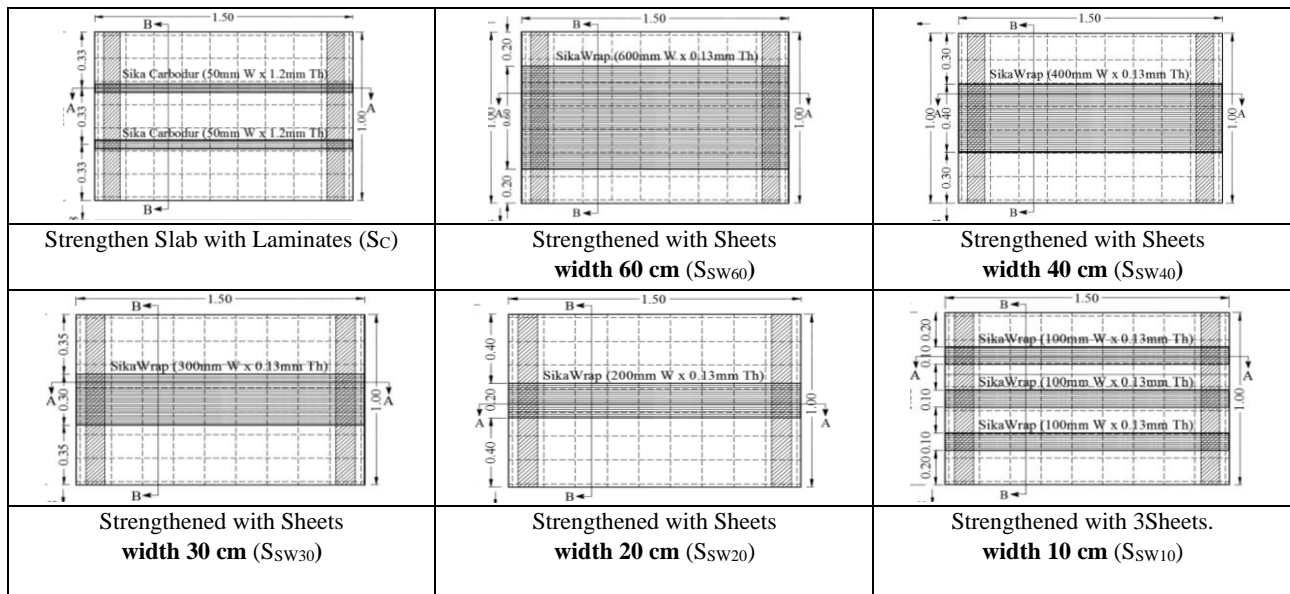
Details of CFRP Strengthening for Test Specimens.
